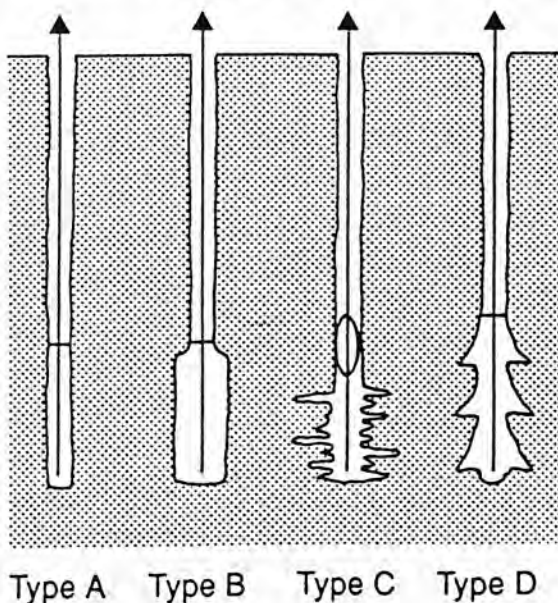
Main types of cement grout injection anchorage (after BS.8081, 1989)
